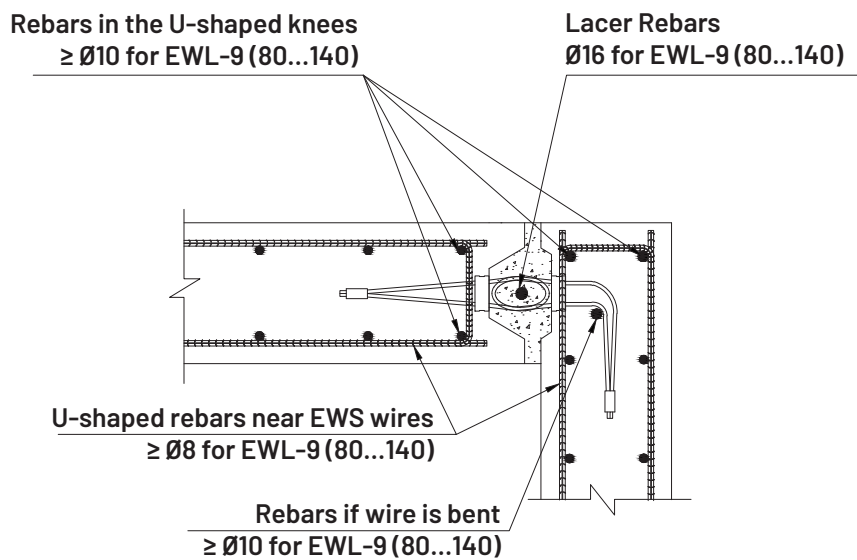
Reinforcement at Wall End with EWL-9 Wire Loops
